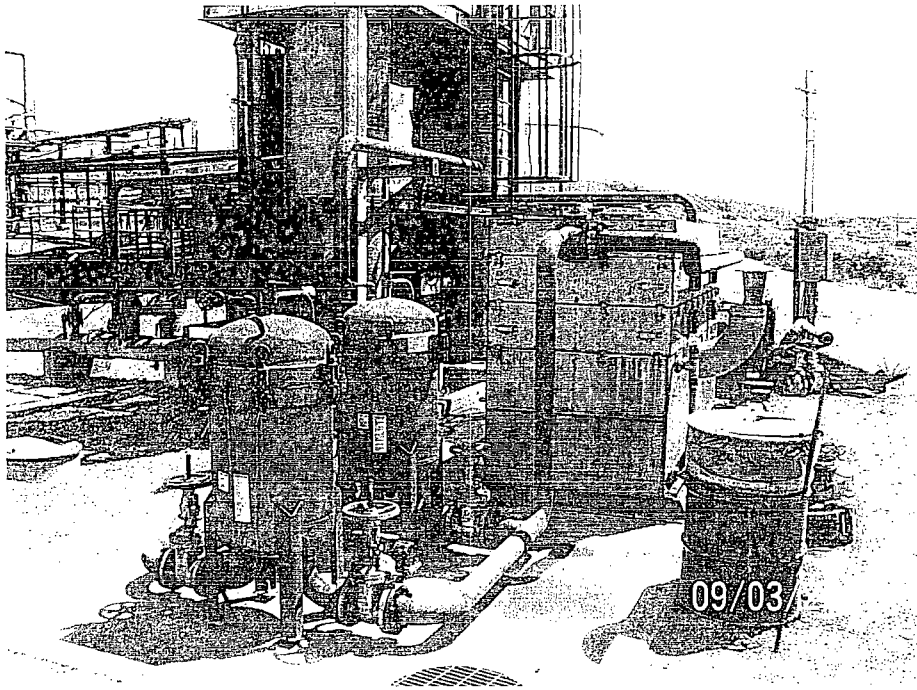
Looking south at the new additional stripper and the new pre-filters (in blue)
